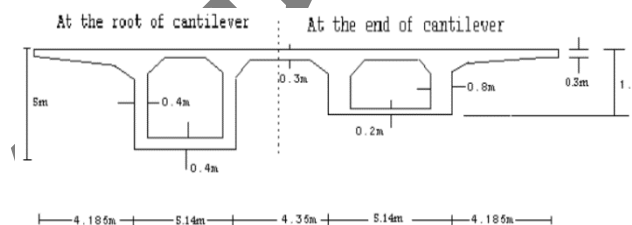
The actual cross-section at the root and the end of the cantilever of Burri Bridge [22]
